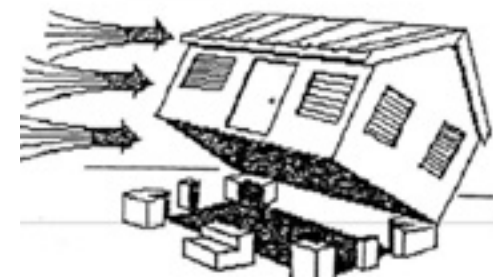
Improper connection to the foundation (Agarwal, 2007)
